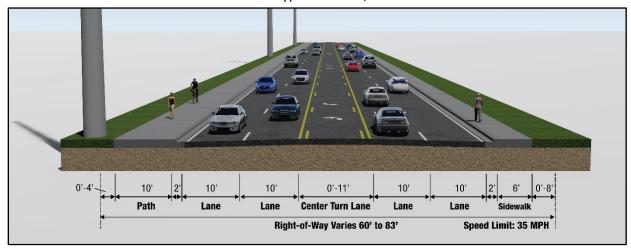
Preferred Alternative Typical Section, Old Canoe Creek Road to US 192
